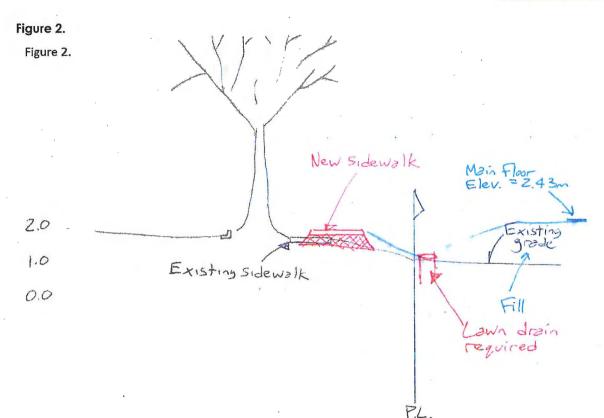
DETAILED TREE RETENTION PLAN FOR TREE TAG# 358
